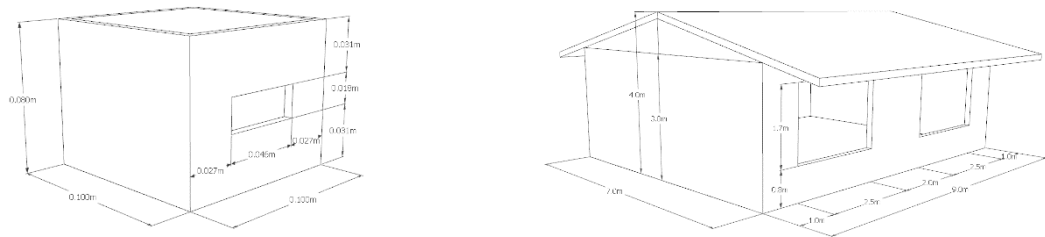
Building geometry description with on the left the cubic building and on the right the school building
